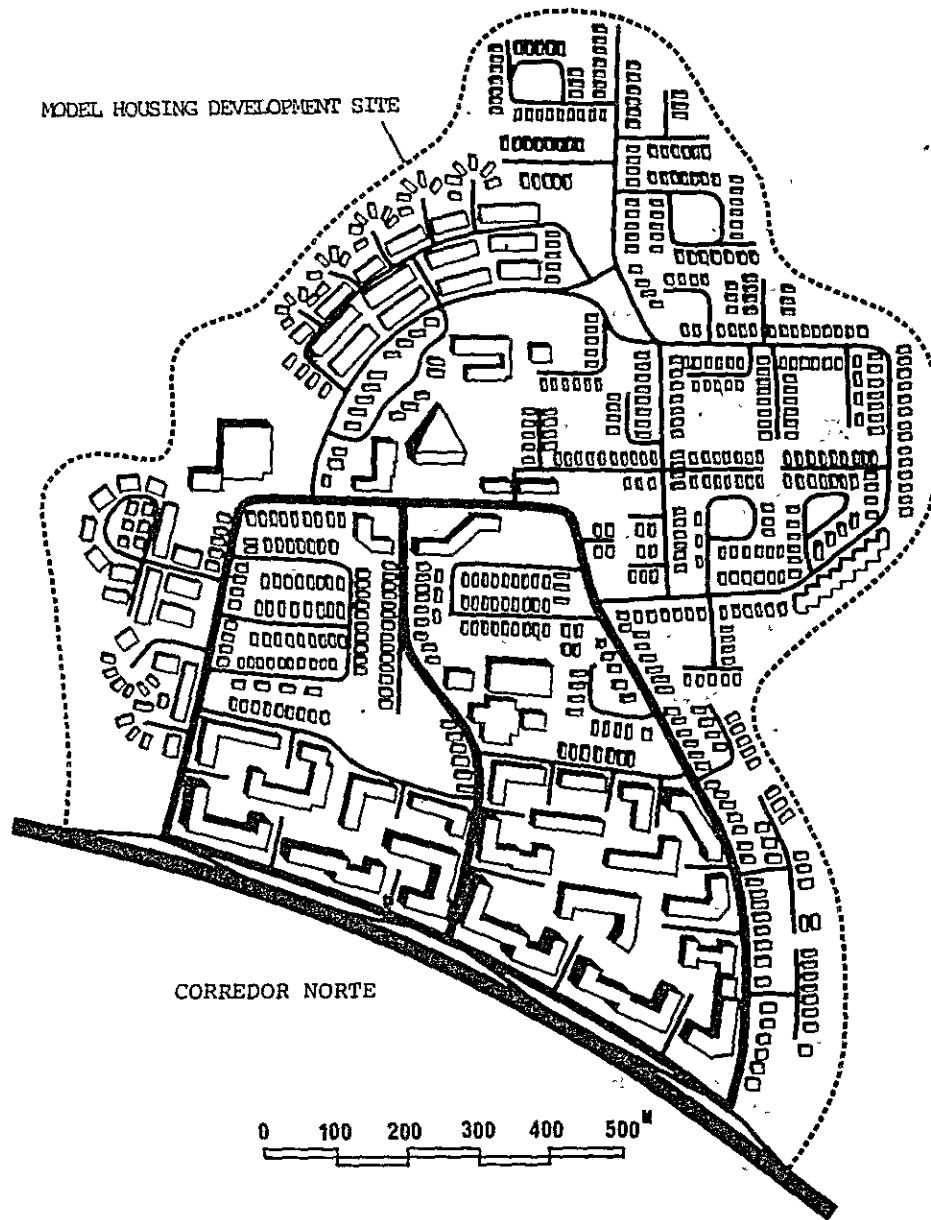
RESIDENTIAL DEVELOPMENT MODEL PLAN ALONG CORREDOR NORTE
